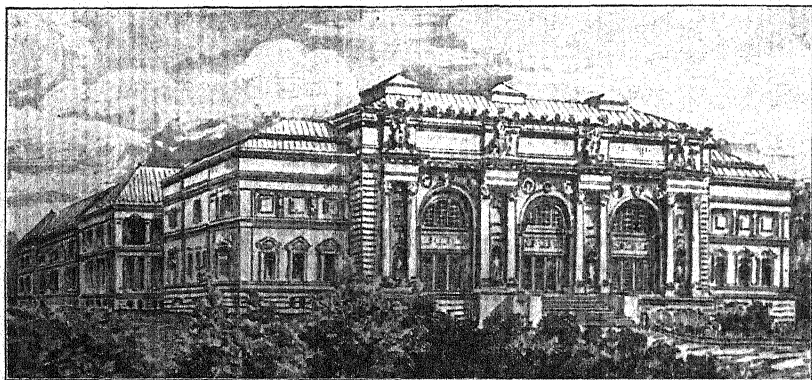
Metropolitan Museum of Art. Sketch of completed building as planned.
